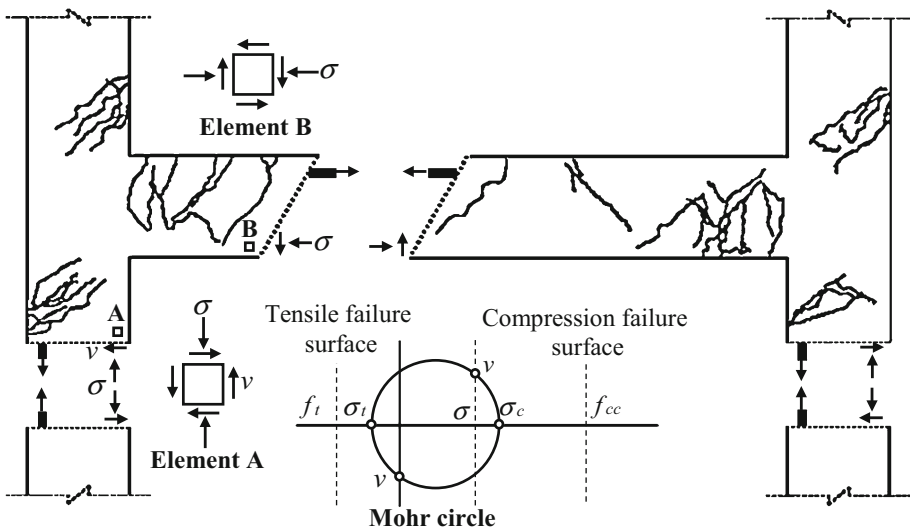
Rankine’s failure criteria (Chen 1982) for concrete
